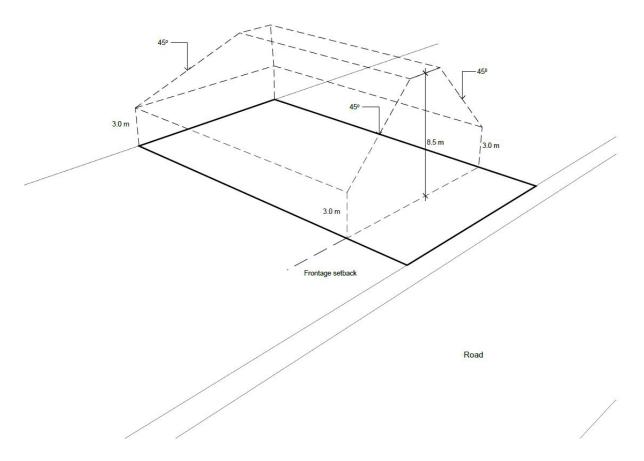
Building envelope as required by clause 10.4.2 A3(a)
